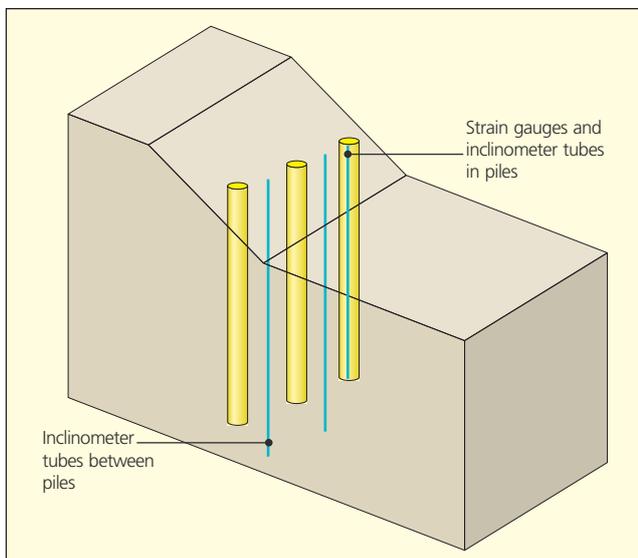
Schematic layout of discrete pile stabilisation scheme and typical instrumentation layout
